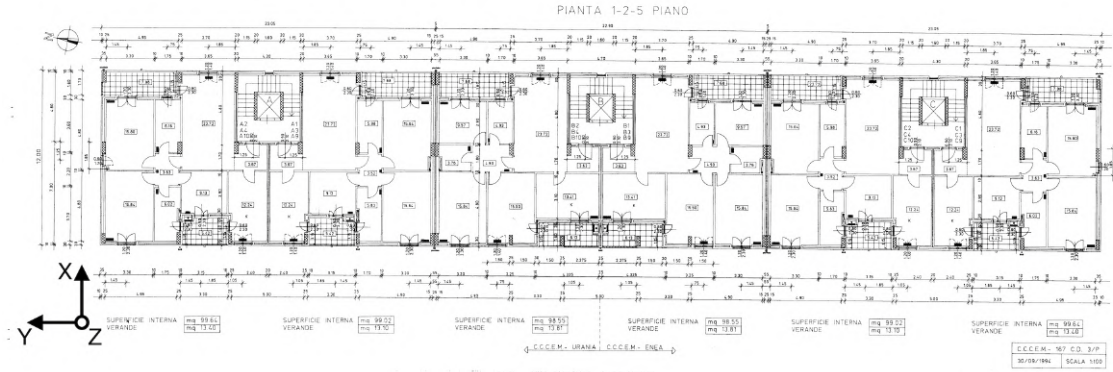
An example floor plan of the building instrumented during the Matera experiment.
